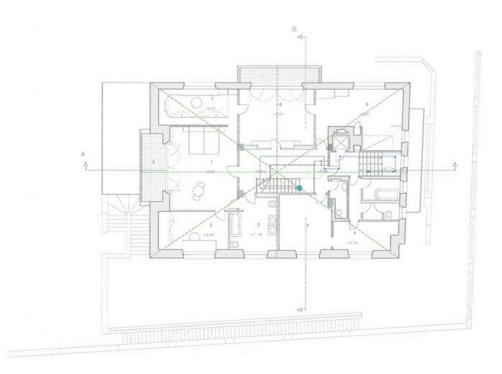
Second Floor Plans of Muller House by Adolf Loos. Source: http://www.mullerovavila.cz
